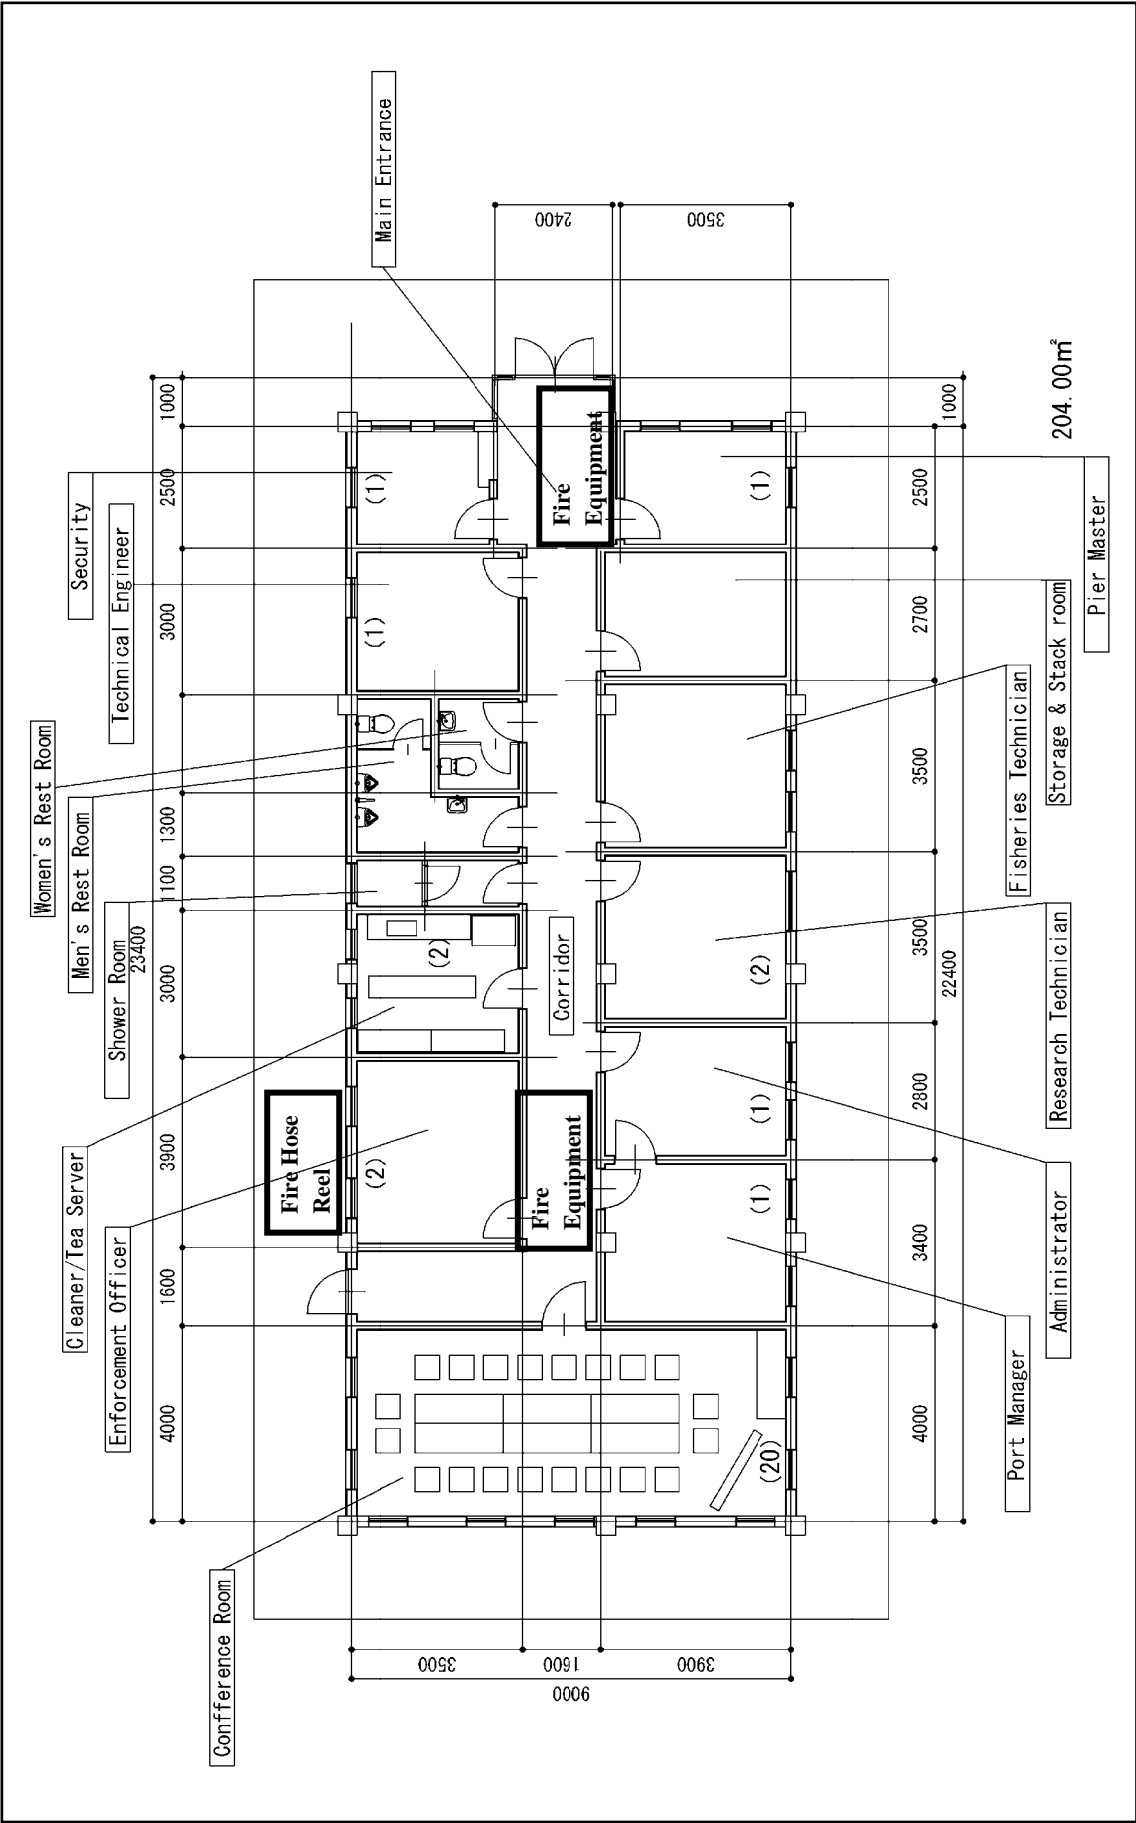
(1) Location of Fire-Extinguishing Equipment (Administration Building at Providence)
